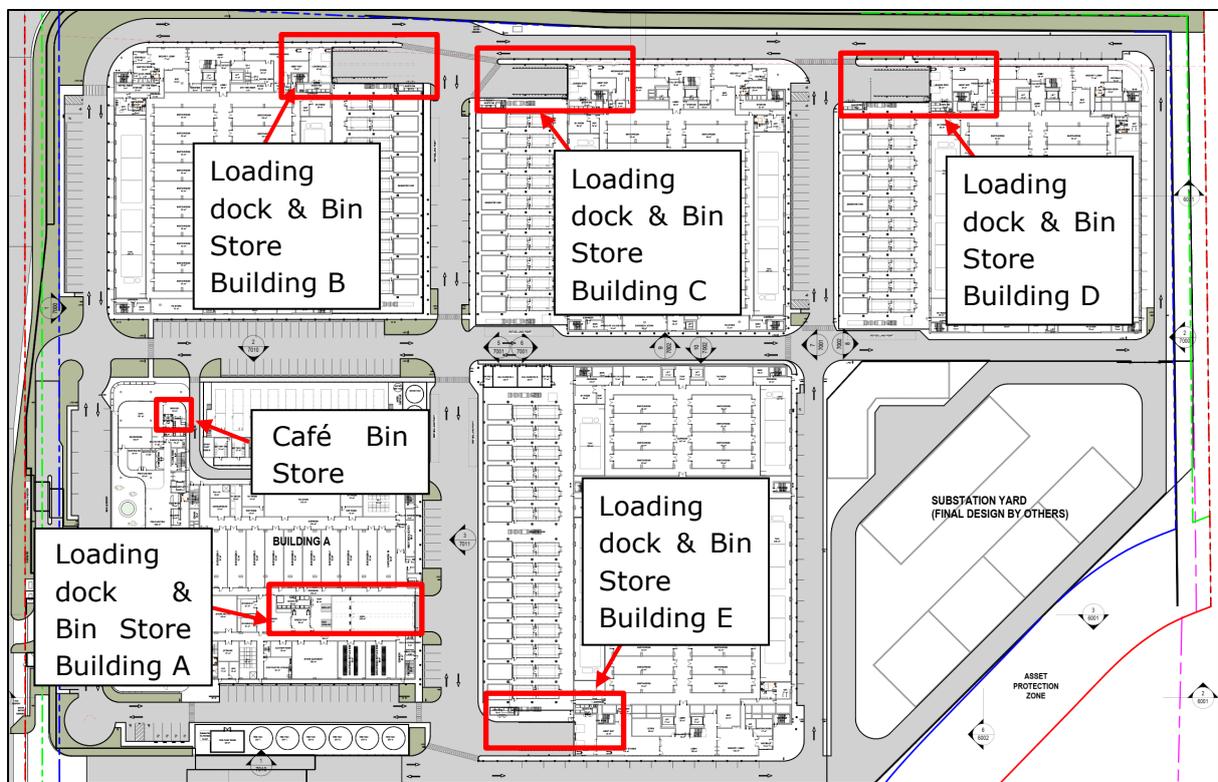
Level 1 (ground) floor plan showing the bin store locations and loading dock
